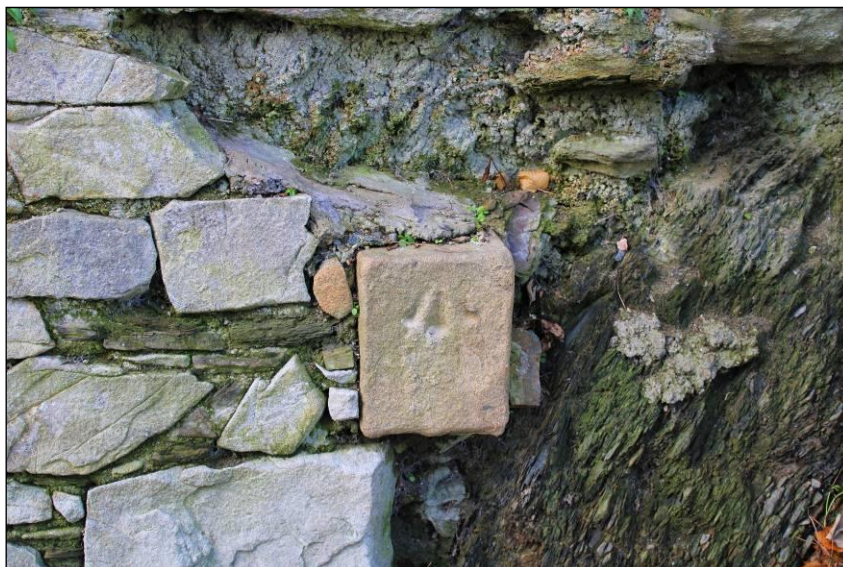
Ordnance survey benchmark on eastern elevation of curtain wall.
